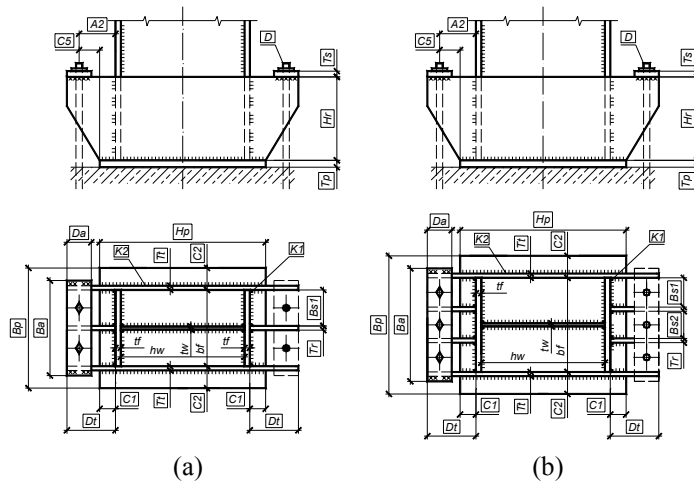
Structural schemes for rigid column bases with external wing plates.
